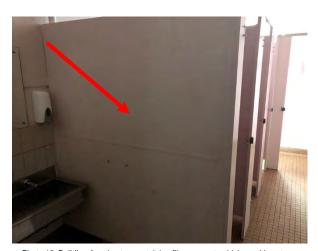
Building A, asbestos containing fibre cement cubicle partitions to Room R1005
